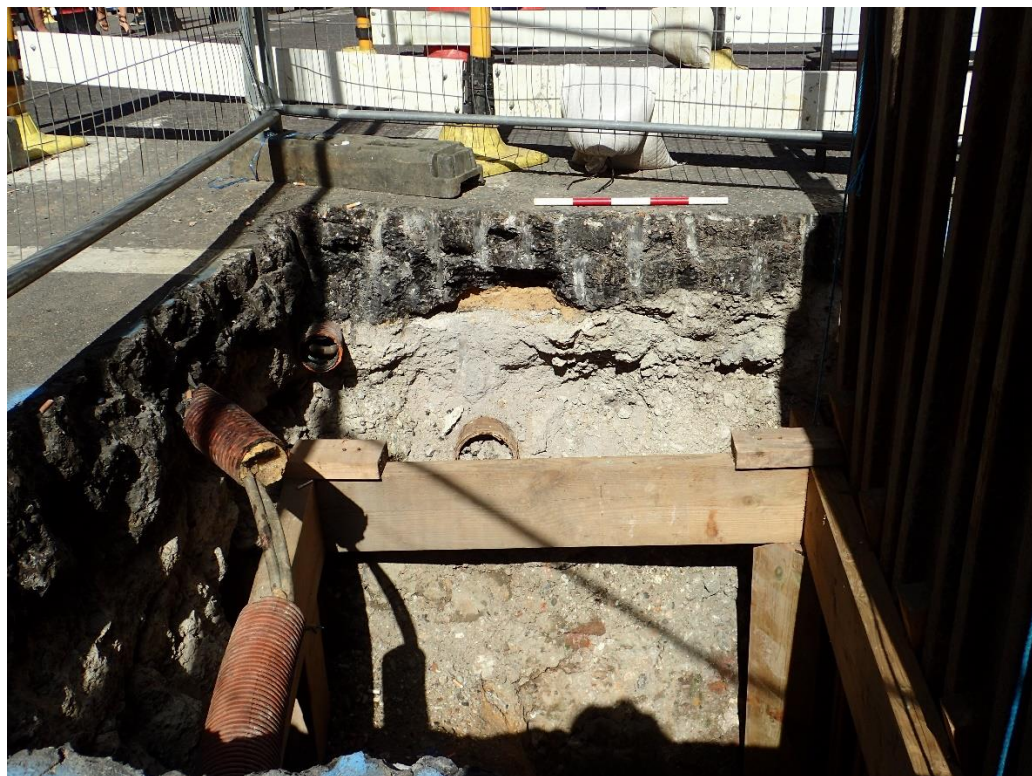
Test Pit 1, Section 8, view to west, scale 1m.
